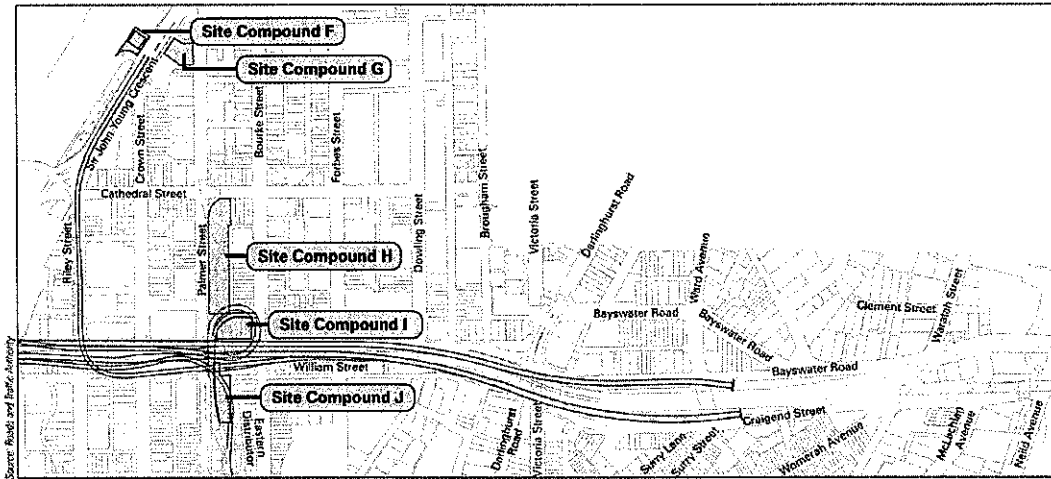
William Street/Riley Street/Sir John Young Crescent Construction Site Compounds
